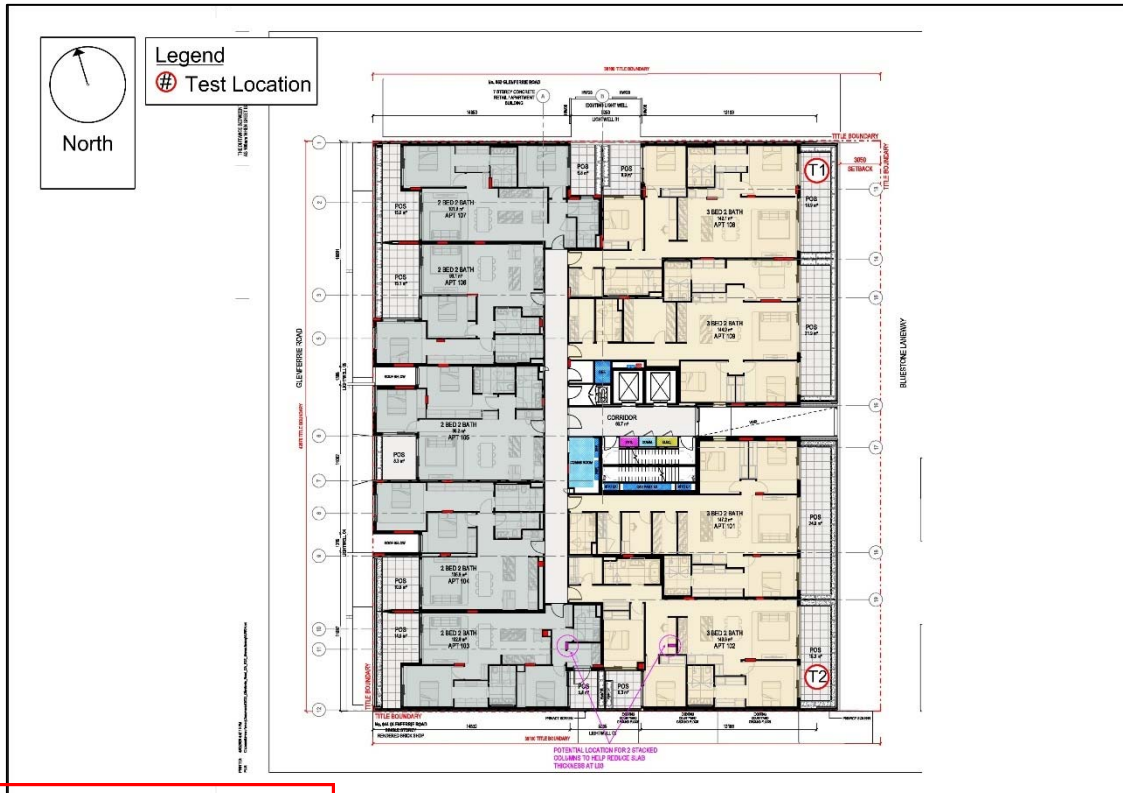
Test Locations on Level 1 of proposed 846-858 Glenferrie Road development.
